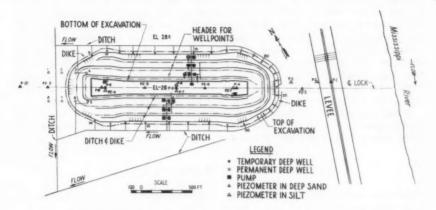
PLAN OF EXCAVATION AND DEWATERING SYSTEM
